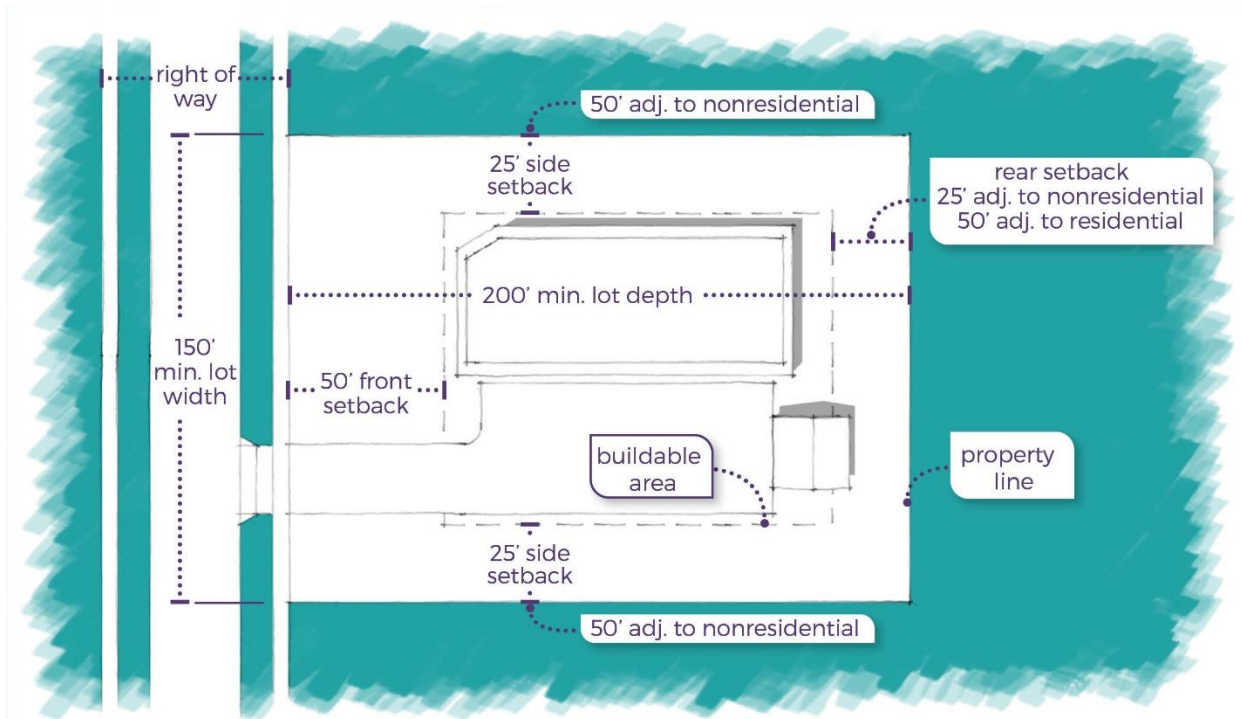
IND SITE DEVELOPMENT REQUIREMENTS
